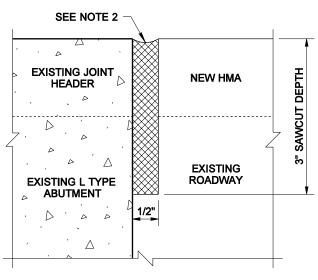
1/2" JOINT SEAL BRIDGE DECK PANELS WITH HMA OVERLAY
